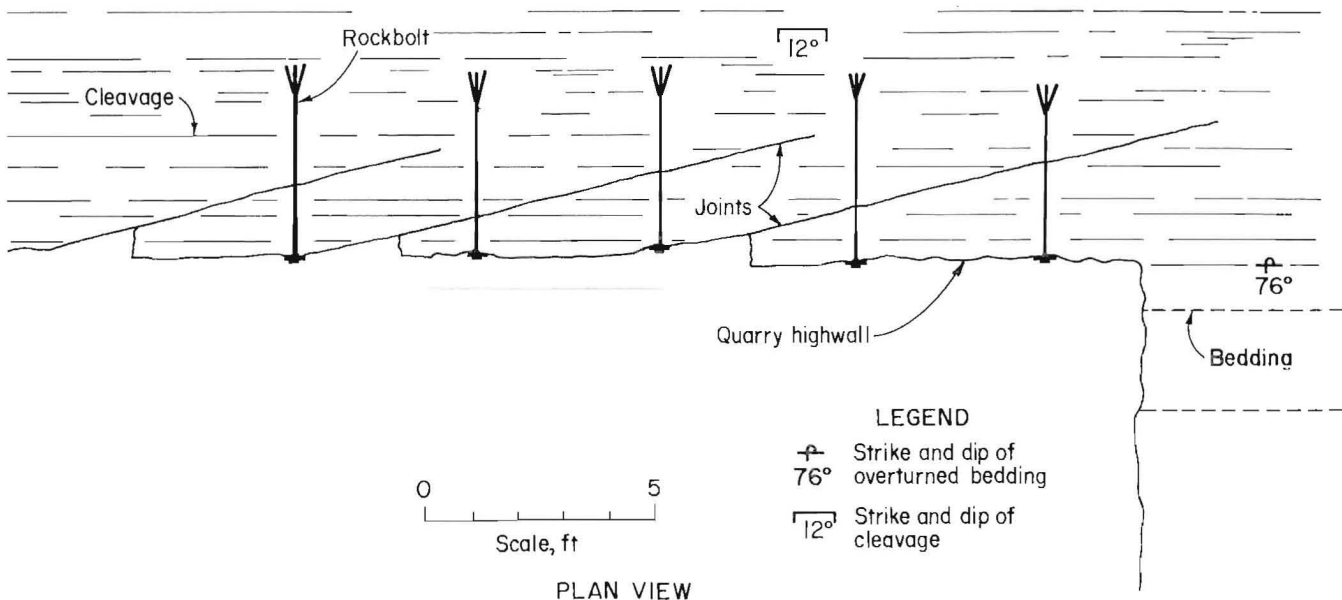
Use of anchored mechanical bolts in tension to secure jointed rock.
